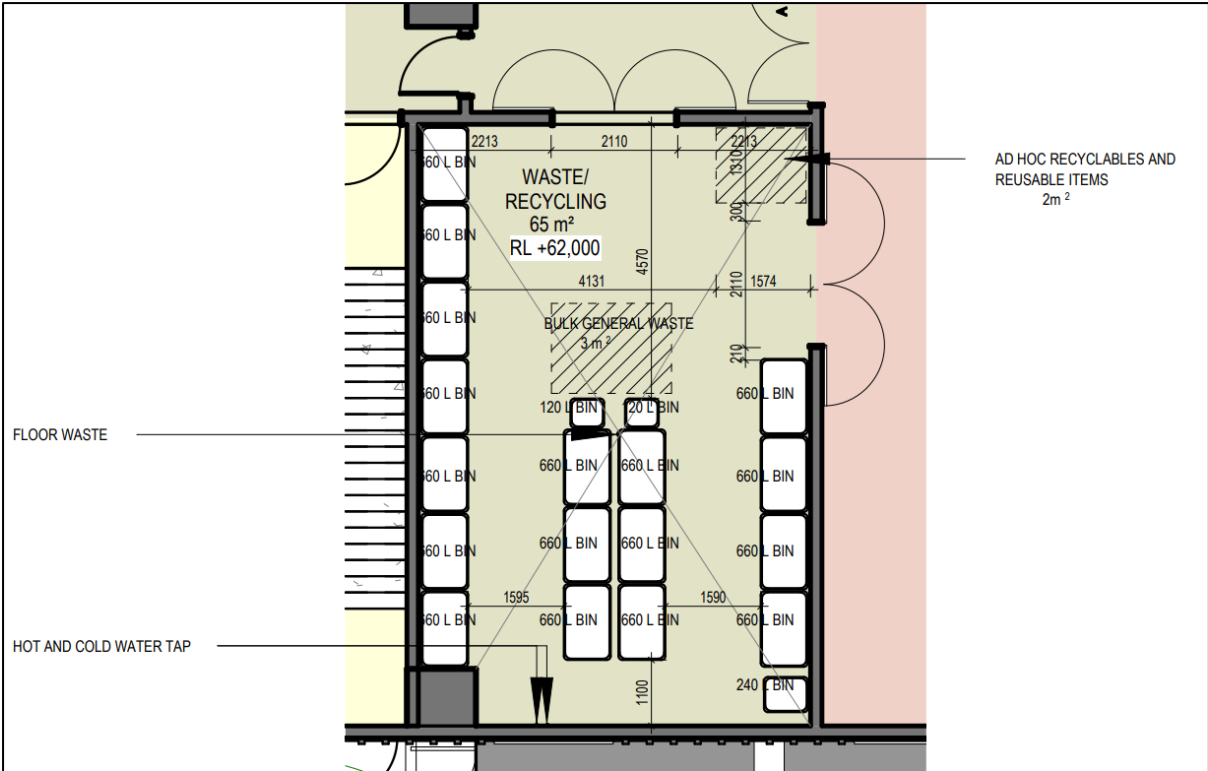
Building A Level 1 floor plan showing the NEXTDC bin store location and loading dock
